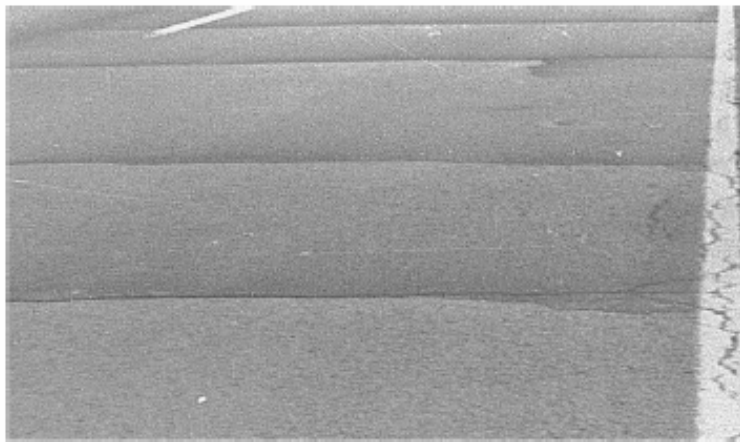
Example of reflective cracking in an overlaid jointed concrete pavement.
